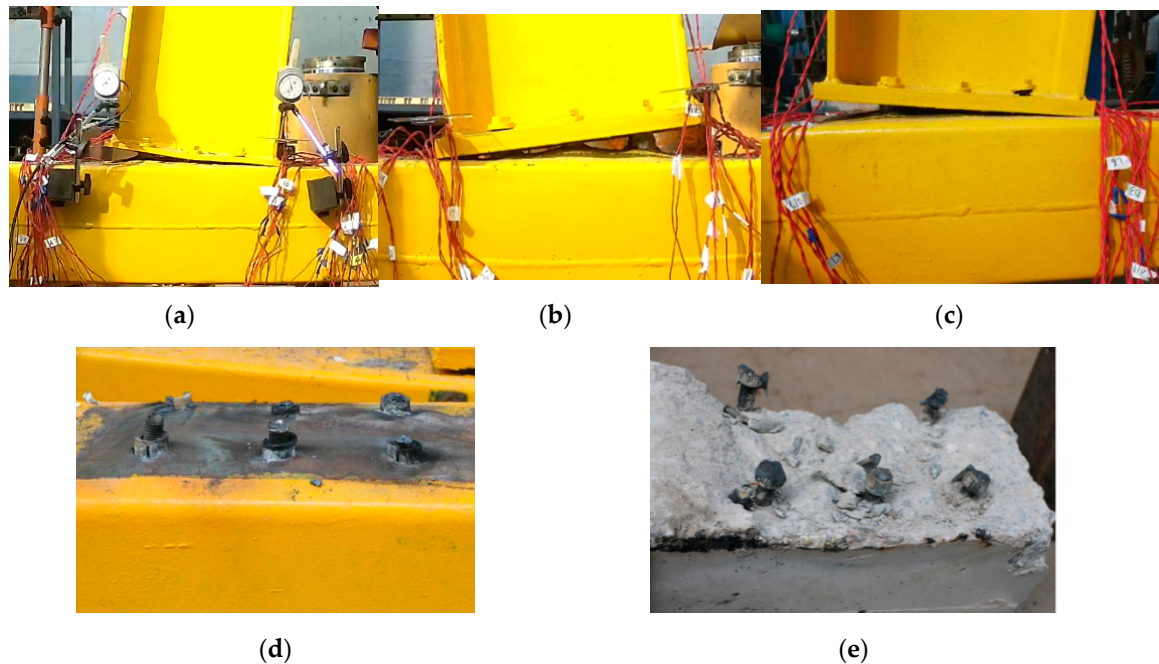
Failure mode I (specimens ST-1, ST-2, and ST-5). (a) ST-1; (b) ST-2; (c) ST-5; (d) tube wall in specimen ST-1; (e) core concrete in specimen ST-2.
